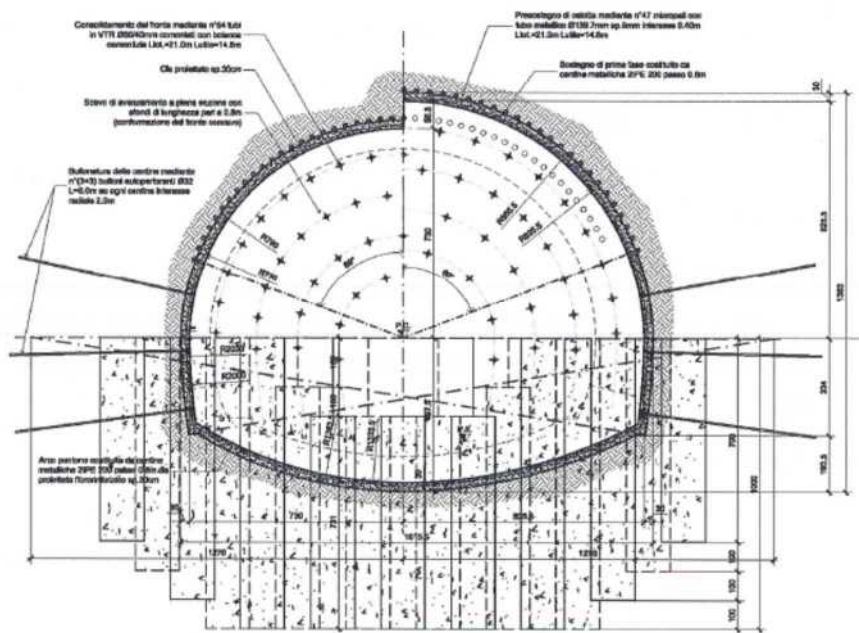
Proposed grouting for tunnelling at southern portal. Source: SPV
